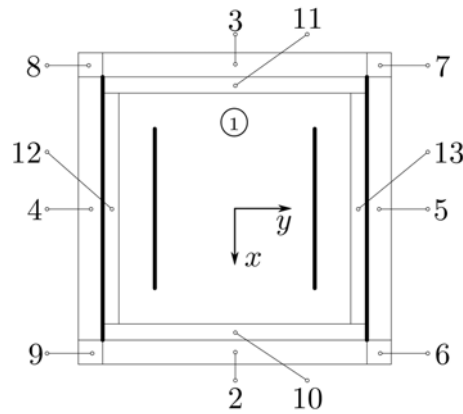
Subdivision of the cross-section of Fig. 8 into 13 elementary rectangles
